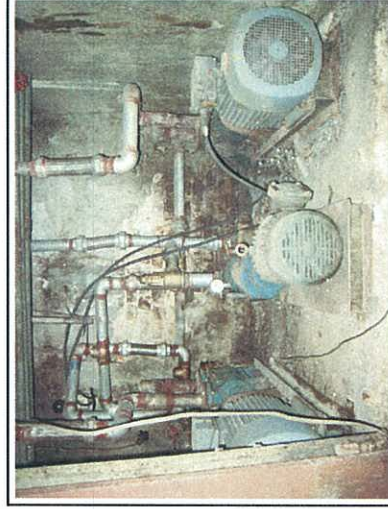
The floor slab under the three pumps next to the concrete box containment was concrete paved with no crack. Stain was suspected on the brick wall (0.2m x 0.2m). The concrete floor slab will be disposed of as chemical waste.
